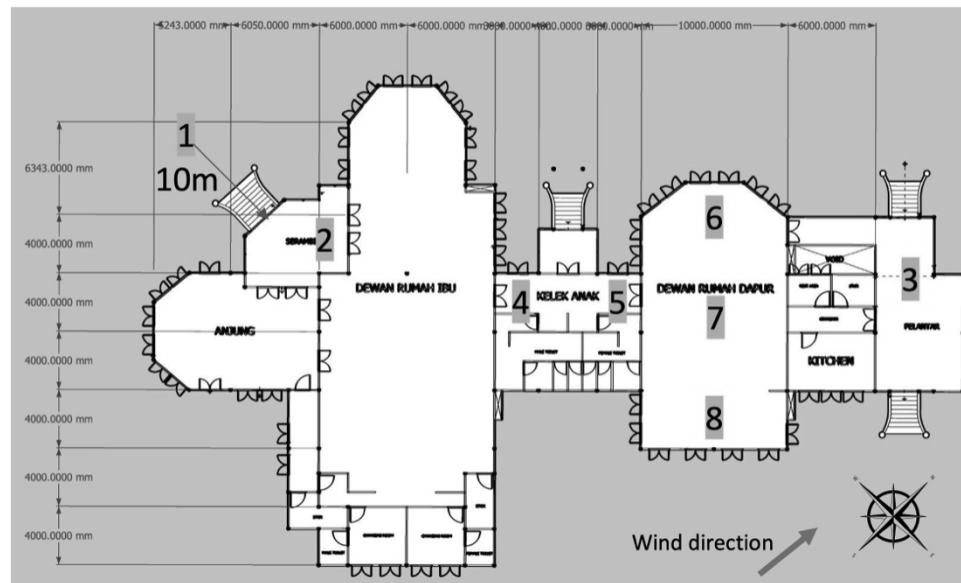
Floor plan of Rumah Limas Hutan Bandar MBBJ Johor Bahru.
